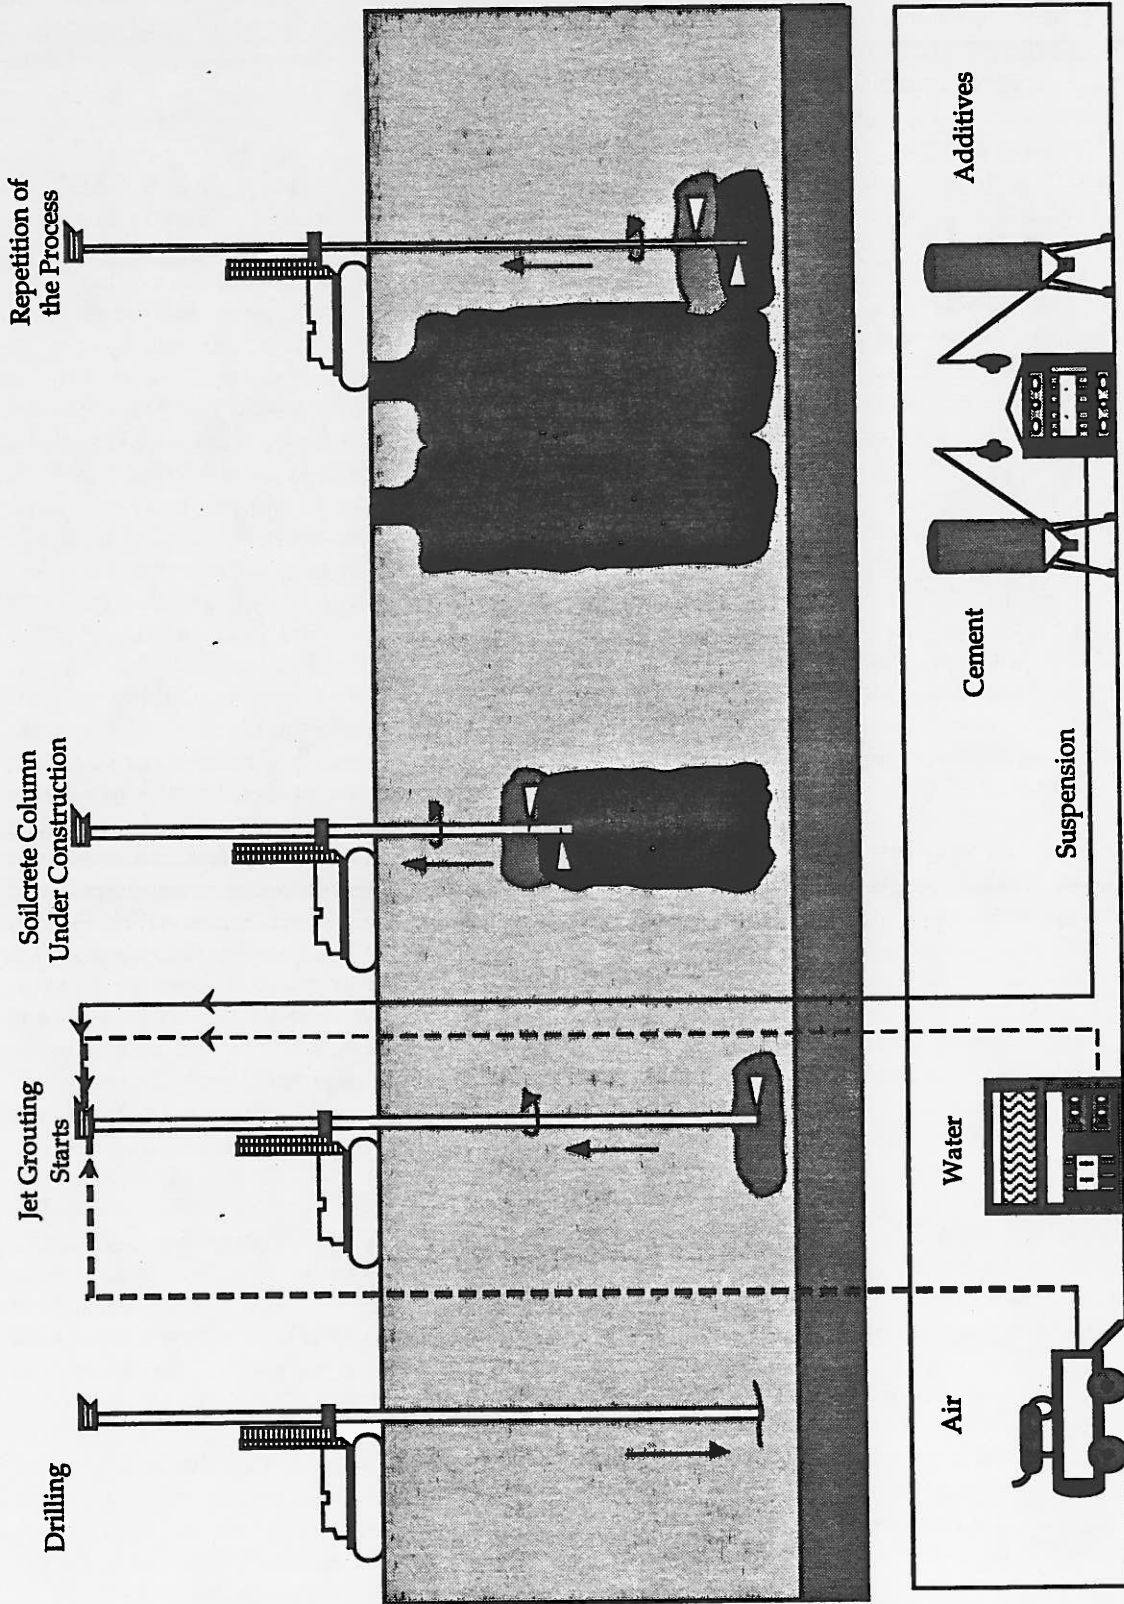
Jet Grouting Plant Layout and Installation Sequence (after GKN, 1993a)
